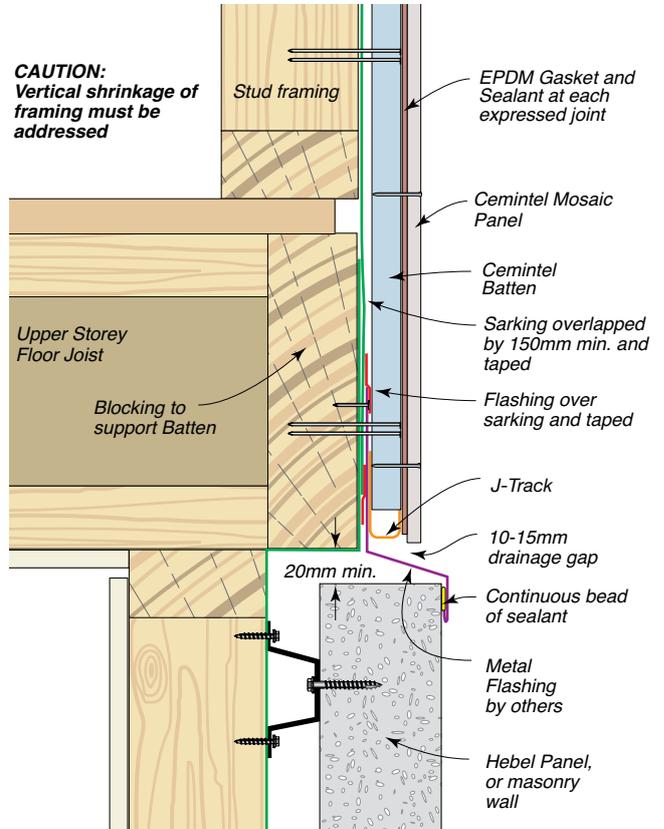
Second Storey Junction with Masonry, Brick Veneer or Hebel Panels In-line Framing
